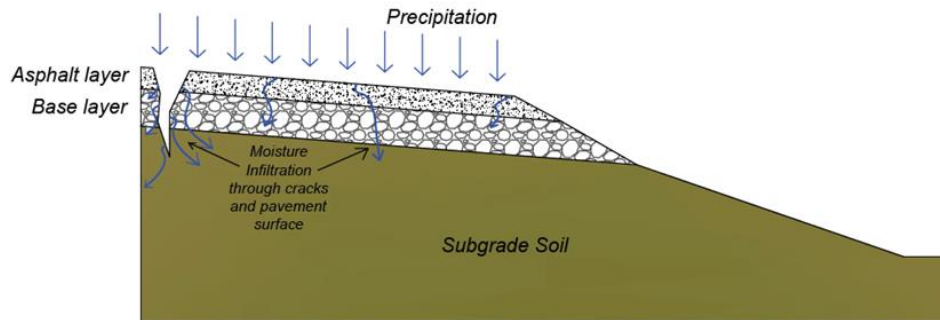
Schematic Illustration of Rainwater Intrusion into the Pavement Layers
